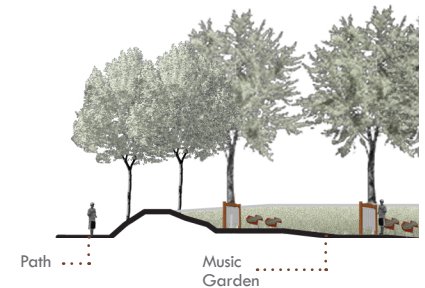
Section AA: Play garden topography, looking north (author 2012).
